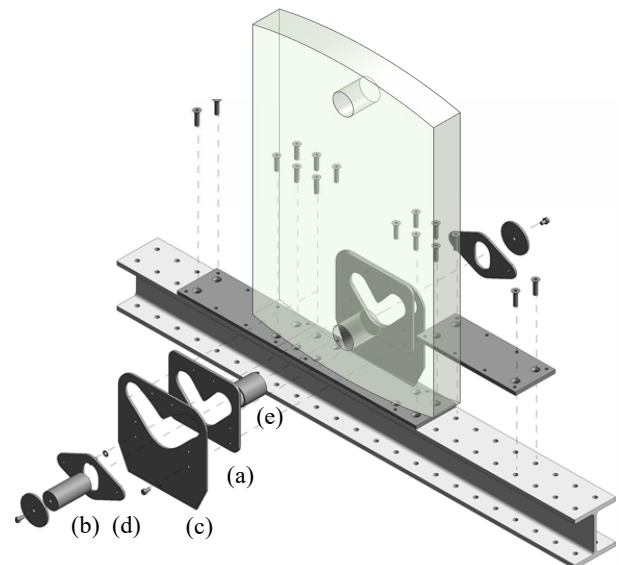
Exploded assembly of steel beam and CLT for NSTR
